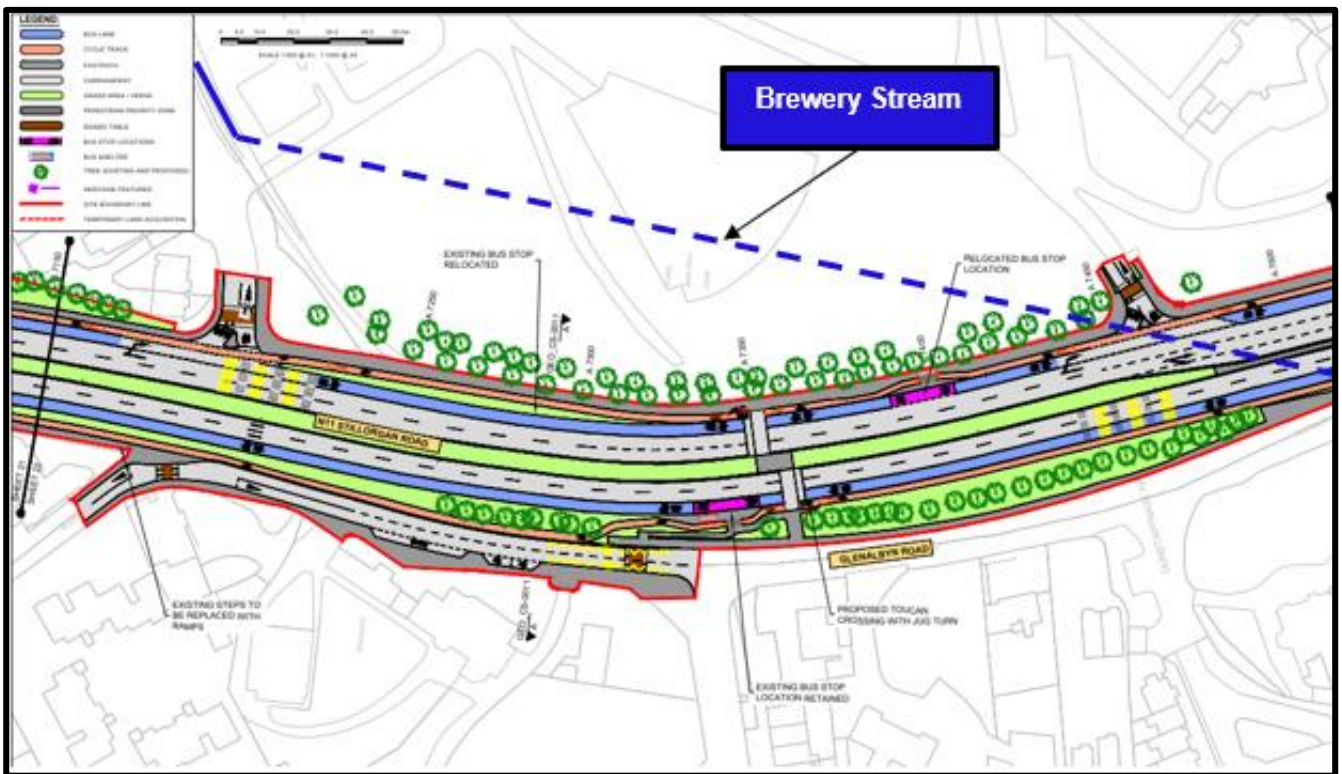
Proposed works at Stillorgan Road, Stillorgan
